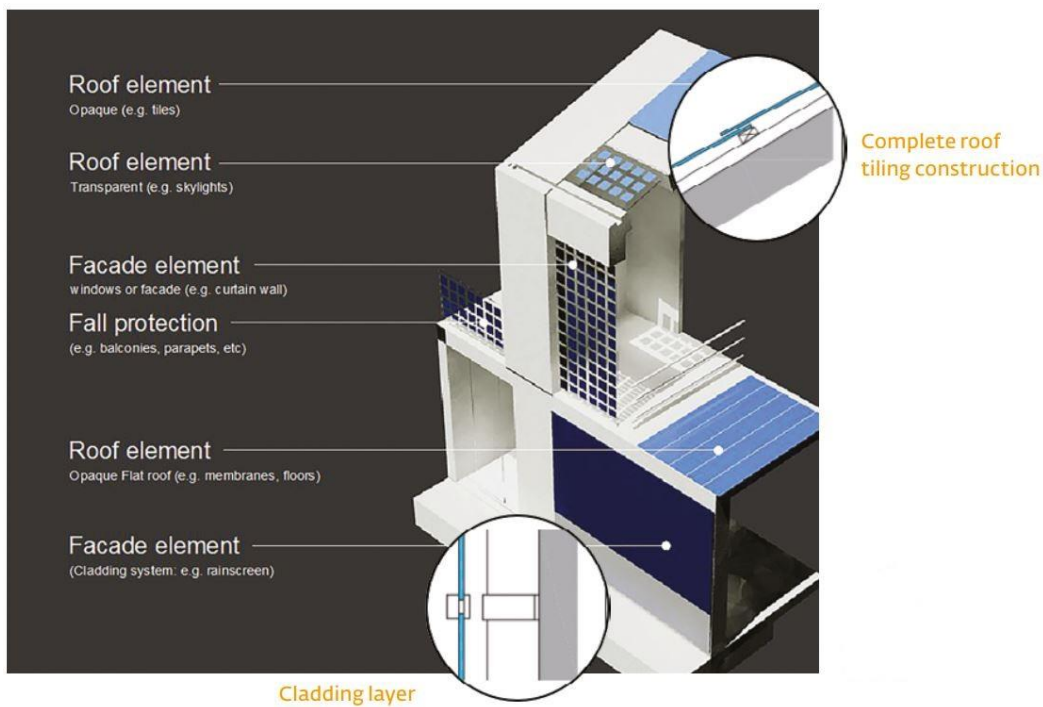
Roof and facade photovoltaic panels in architecture (Zanetti et al., 2017)
